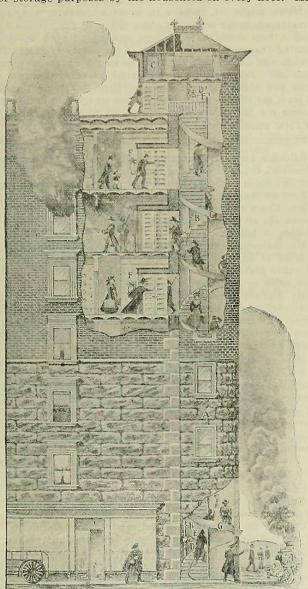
REVOLVING FIRE DOOR AND TOWER ESCAPE.
